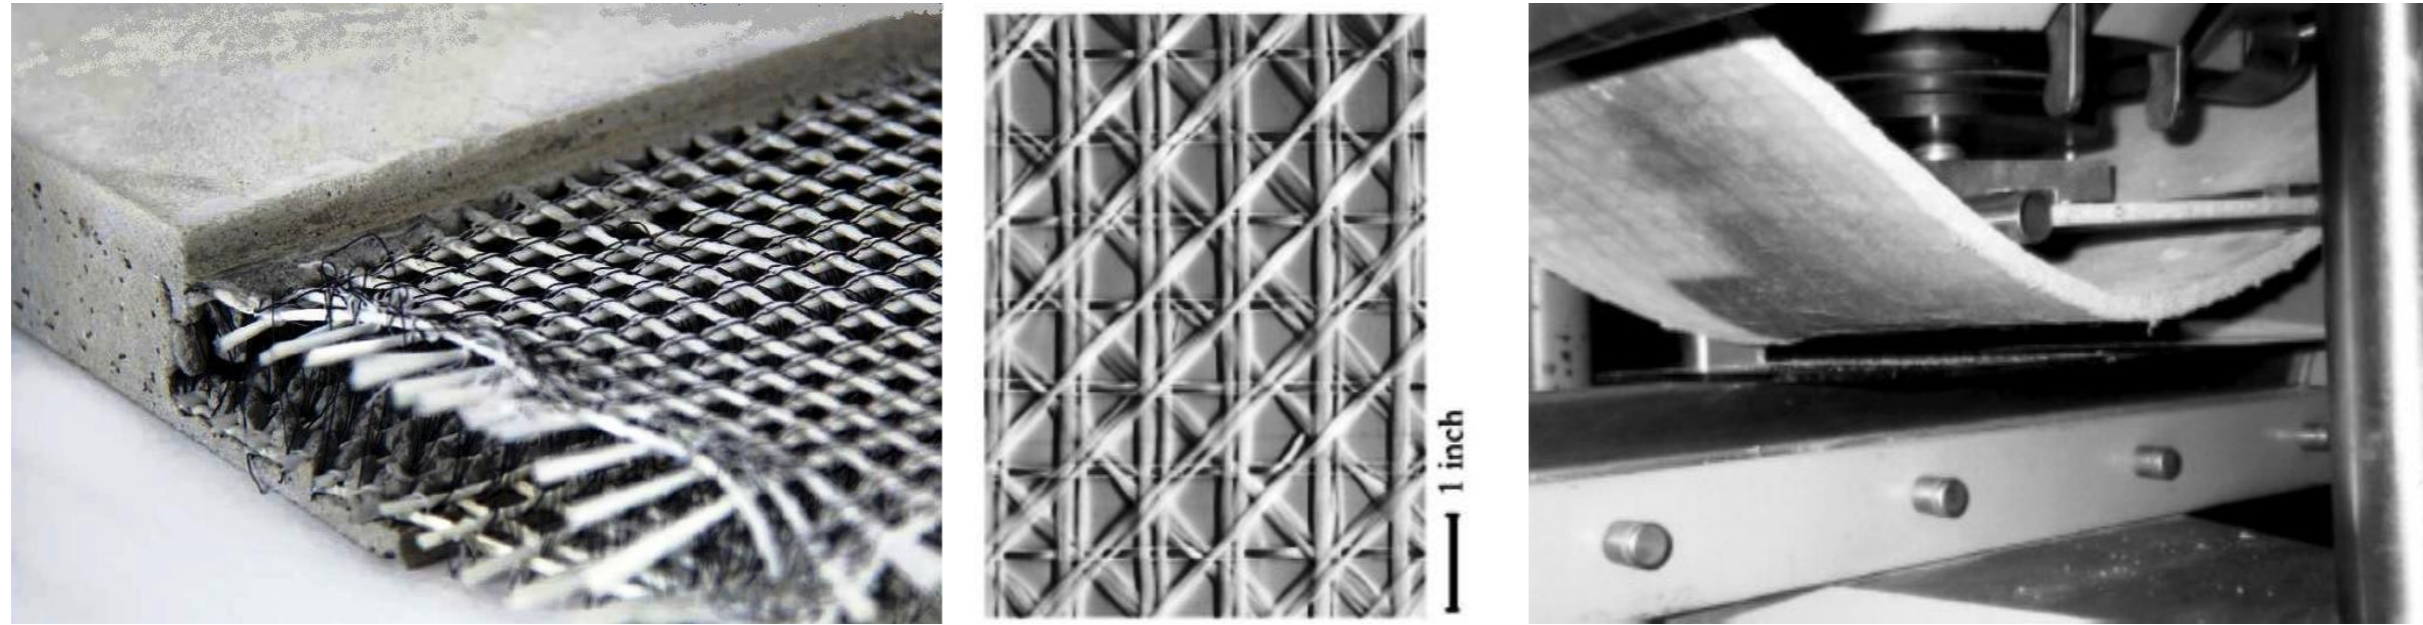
Textile Fibre Reinforced Concrete – “TFRC”, Sample of textile fabric reinforcement, and Bending of Textile Reinforced Plate.
